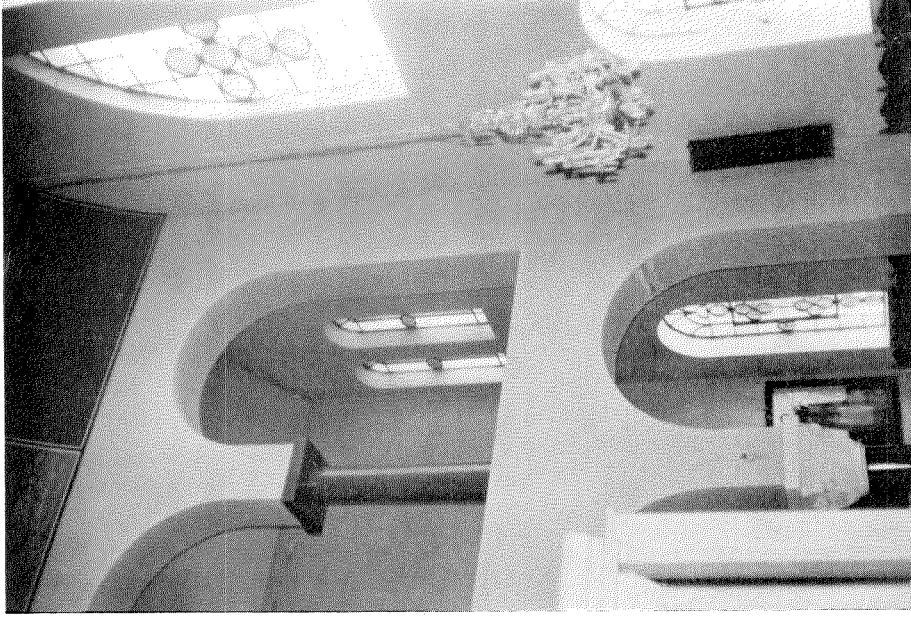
Church of Agia Barbara in Toumba. Cracks on the interior walls and arches.
